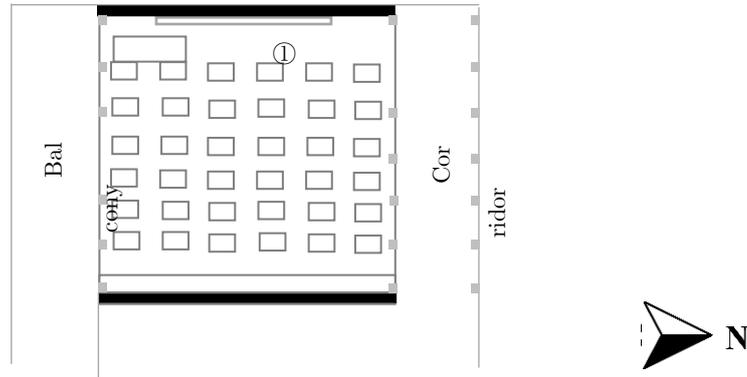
Classroom floor plan and CO₂ measurement item position (①)
